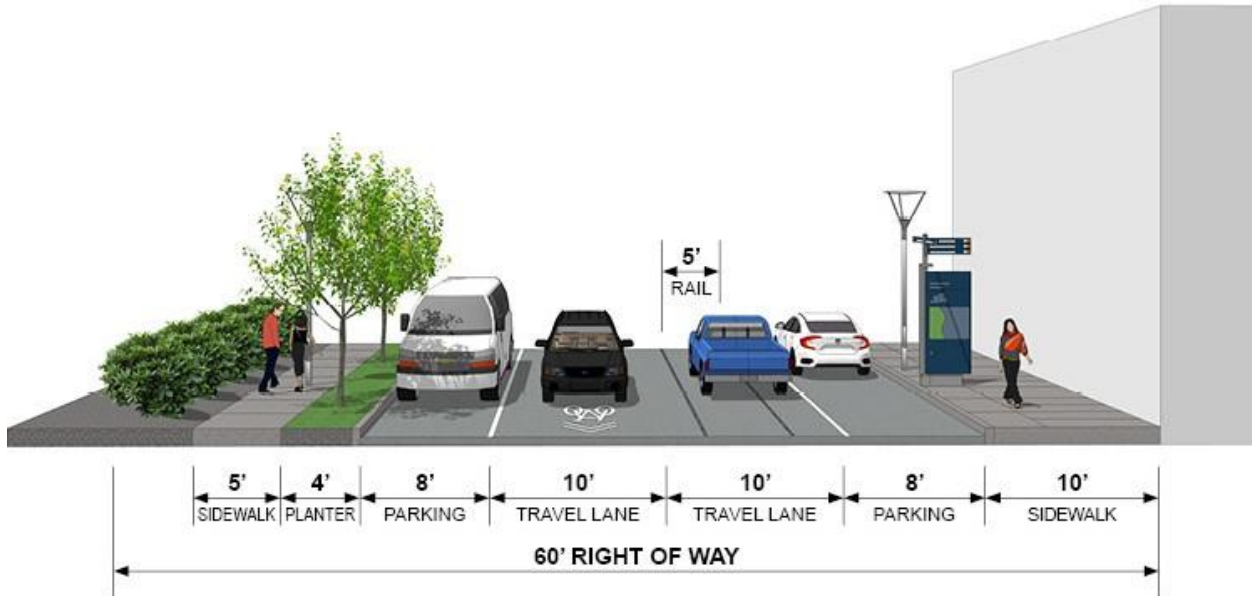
Alternative 2 - Proposed Section C and D (Cedar Avenue to Alder Avenue)
